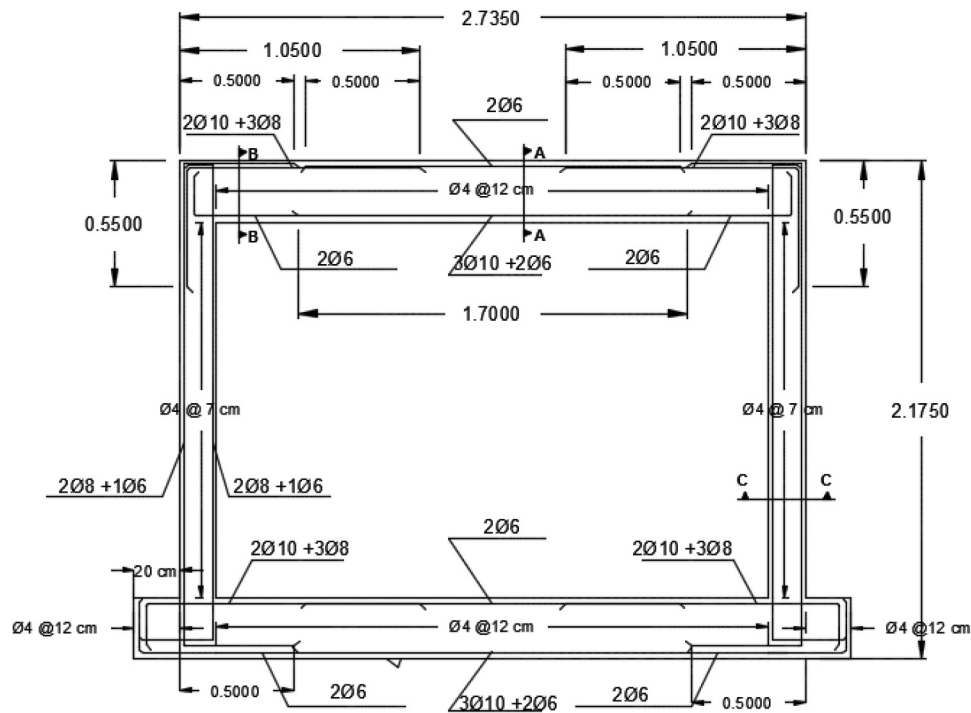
Geometry and reinforcement scheme of the reduced scale RC frame.
